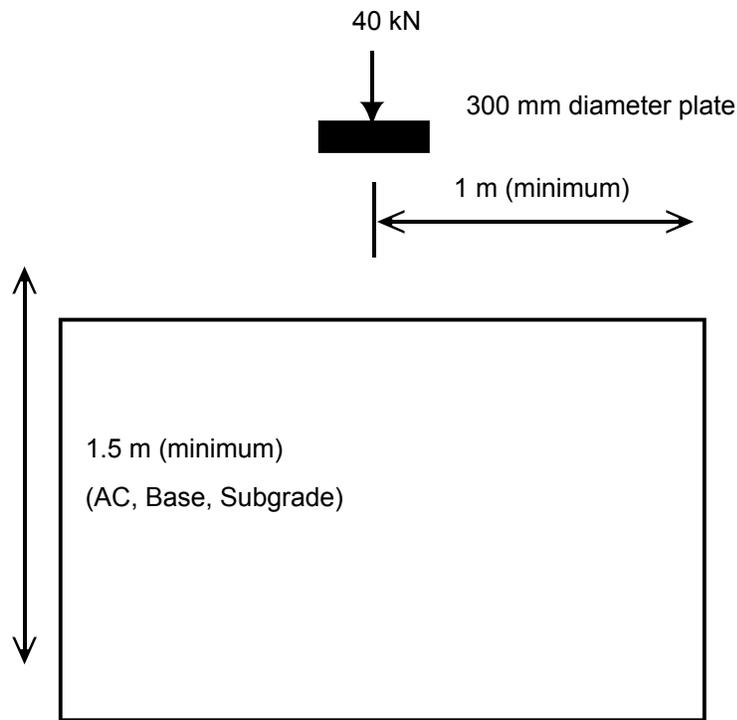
Minimum box dimensions, plate load and plate dimensions for a test-box pavement test facility.
